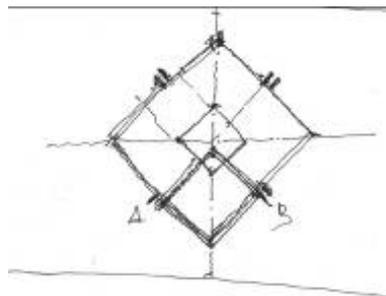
architect's sketch showing the hyperbolic/parabolic roof plan
